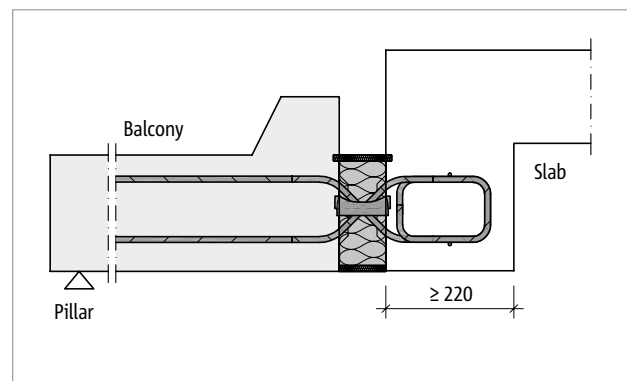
Schöck Isokorb® T type Q-E-W-VV: Installation situation "pre-cast balcony slab"
